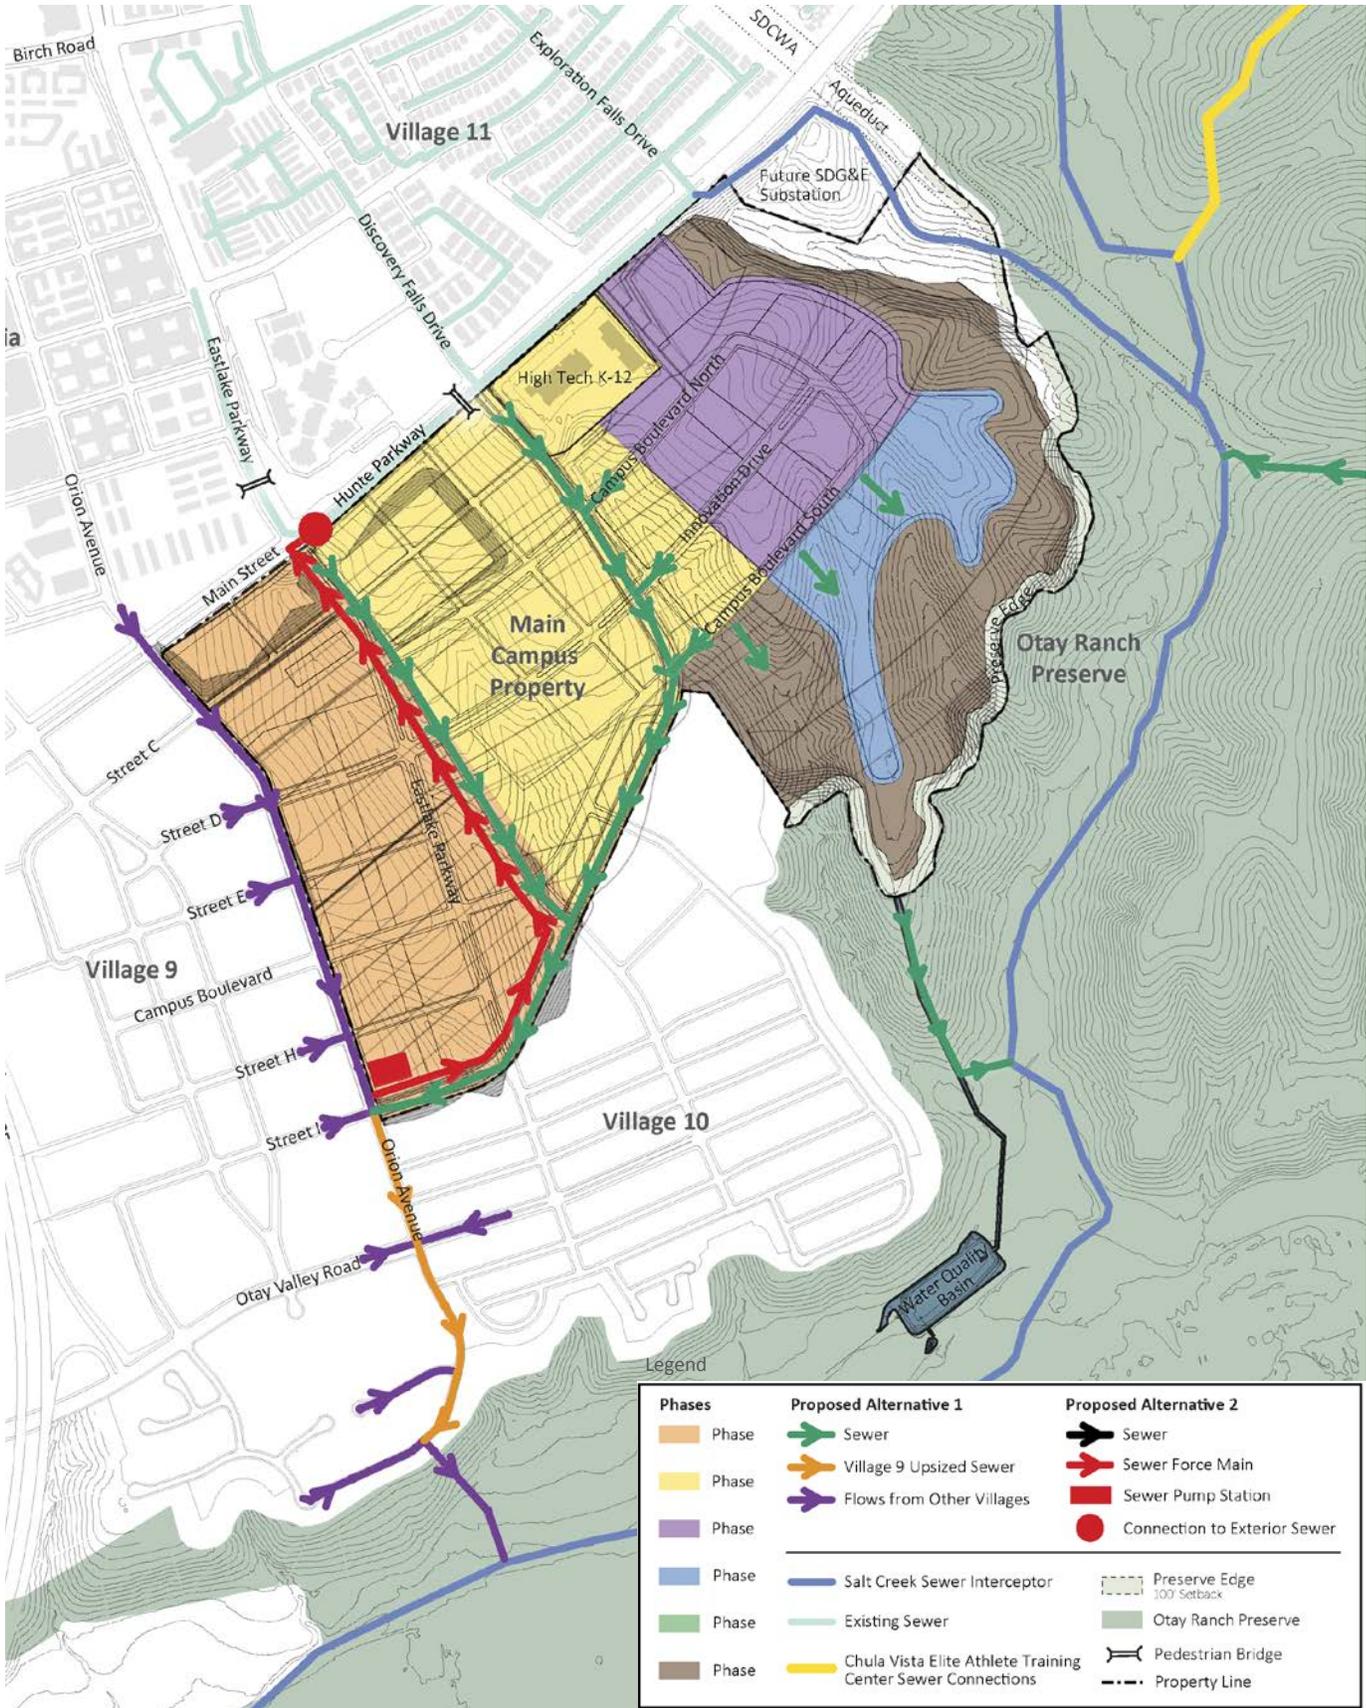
D: MAIN CAMPUS PROPERTY CONCEPTUAL SEWER PLAN
